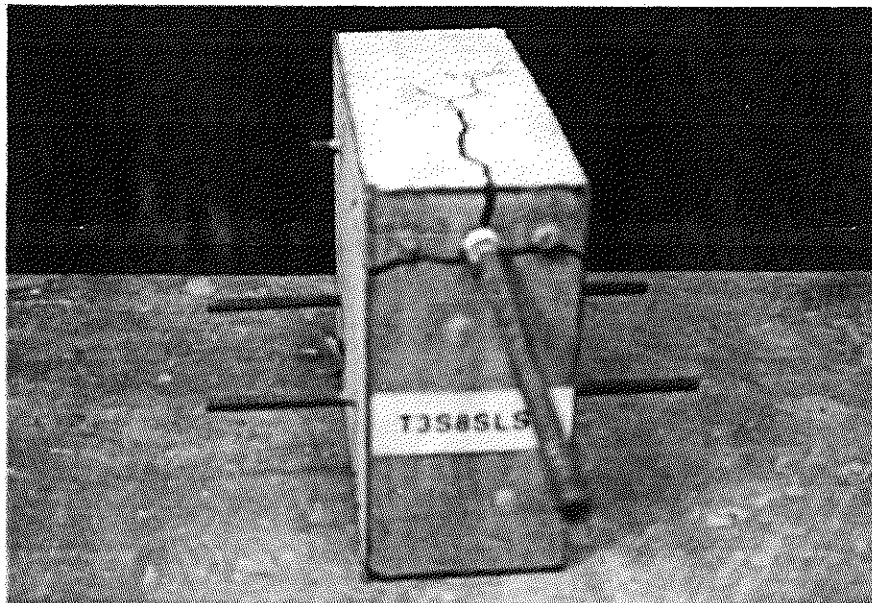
Beam-end test specimen without transverse stirrups after failure. Cracks on the front face of specimen form an inverted T centered on the test bar
